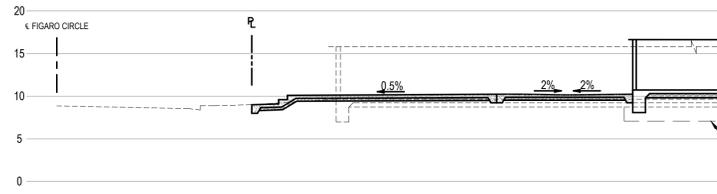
DETAIL BUILDING DRAINAGE AT HARDSCAPE
